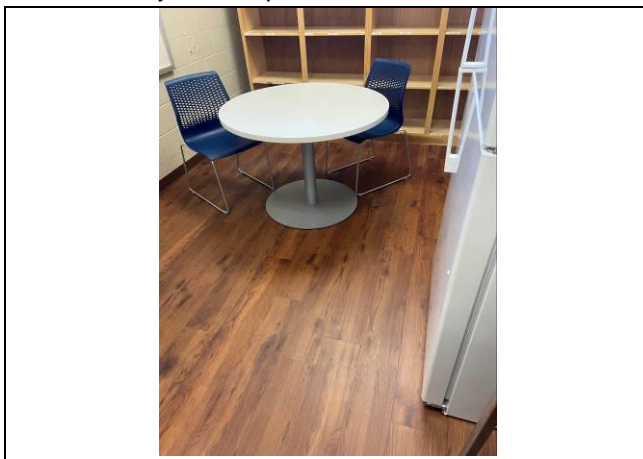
View of assumed ACBM dark wood laminate flooring observed in faculty break room.
